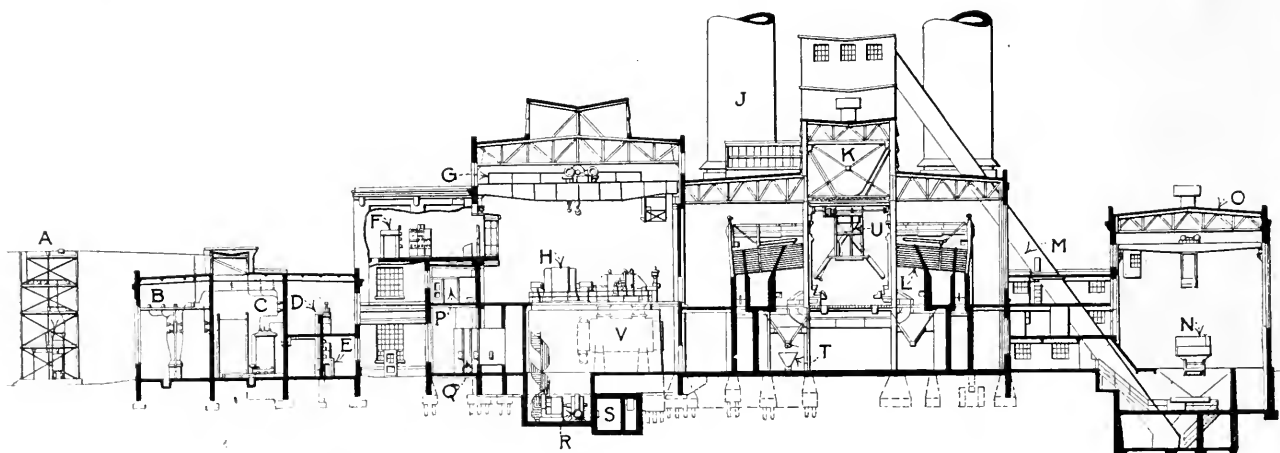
CROSS-SECTION OF HAMILTON (ONT.) STEAM PLANT
